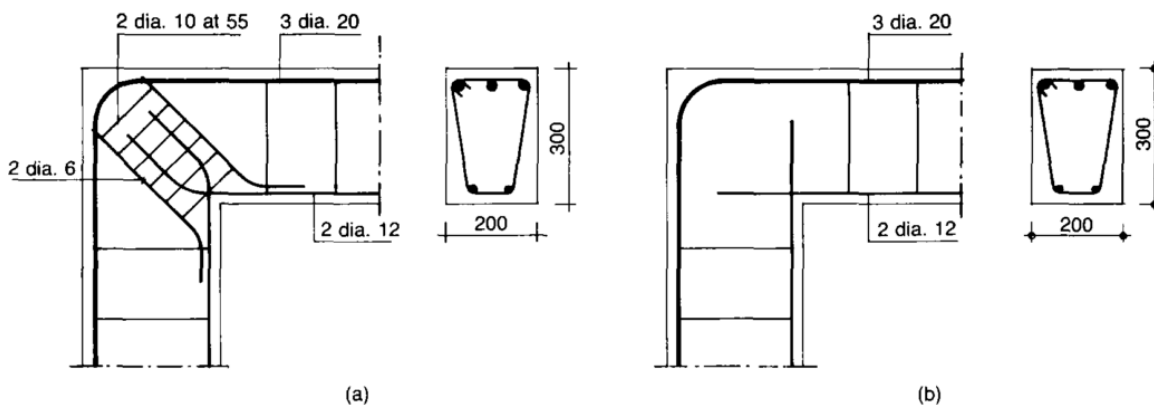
Reinforcement Details in Corners Used by Zouzou & Haldane (1993)
